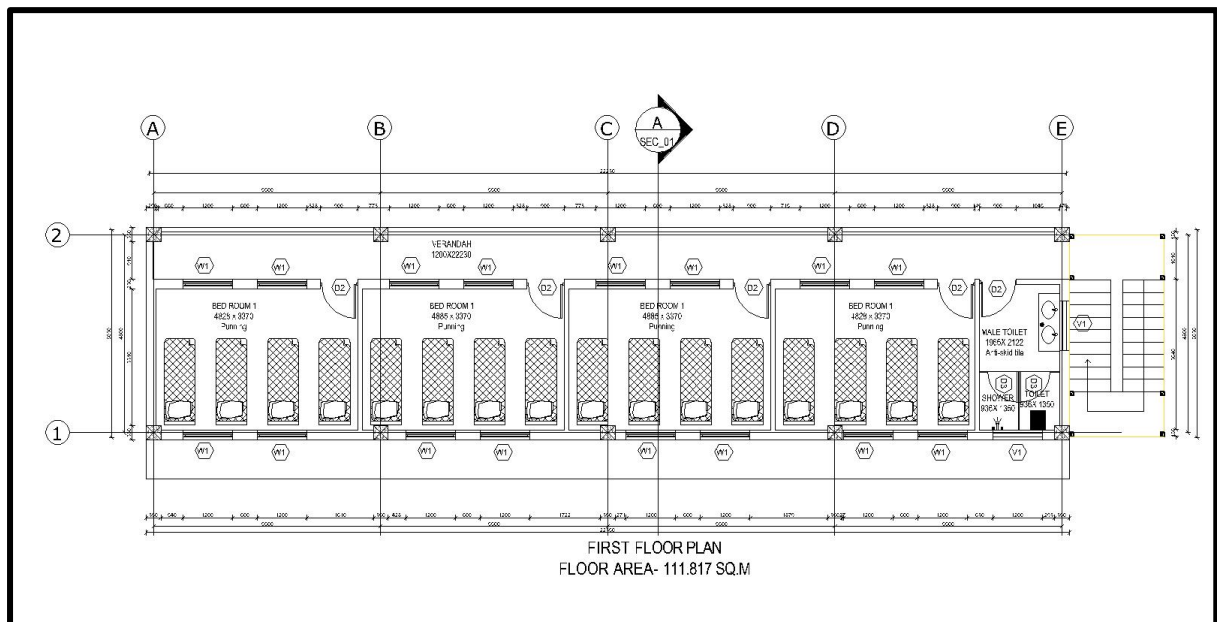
General Layout of the Proposed Building (First Floor Plan)
